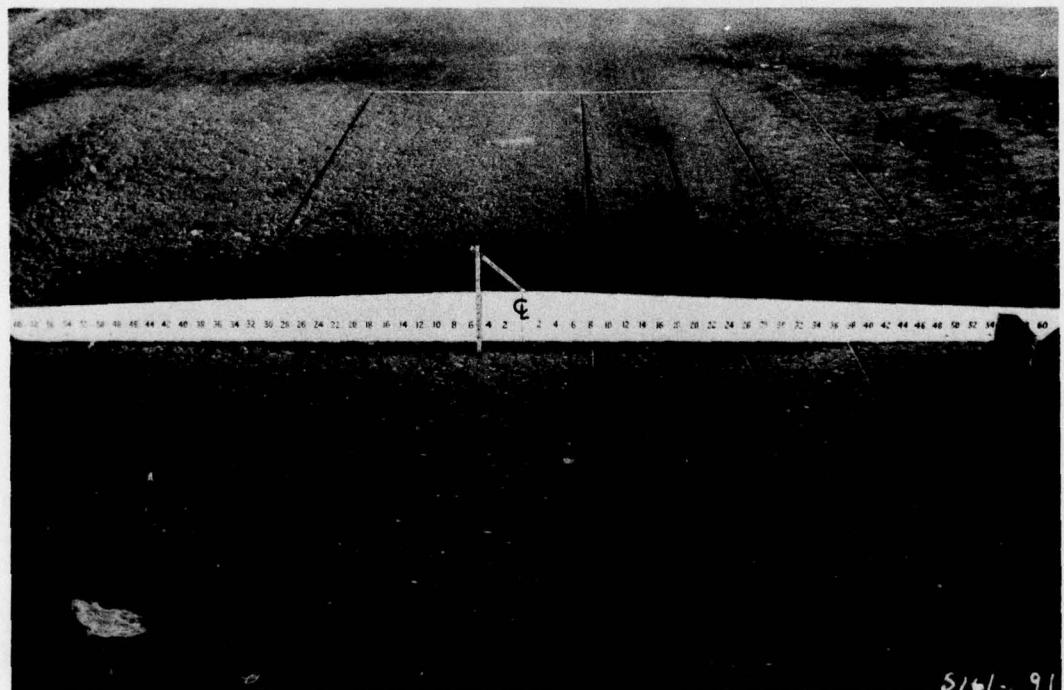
Test Section No. 4, item 3, after 480 passes of load wheel
